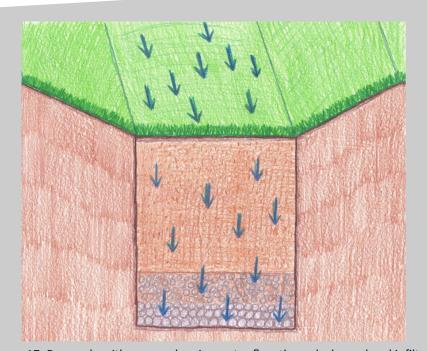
Dry swale with arrows showing water flow through channel and infiltration into ground
